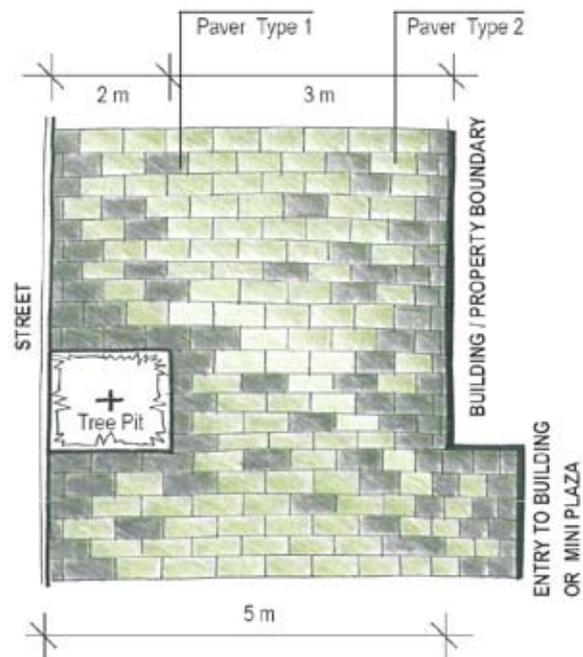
(b) – Footpath Paving – Stringybark Road & 'A' Street (Town Centre)
